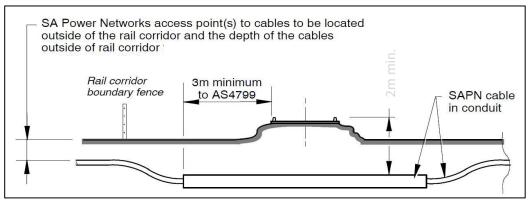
Conduit/Casing Extension (Crossing) under Railway or Tram Lines
